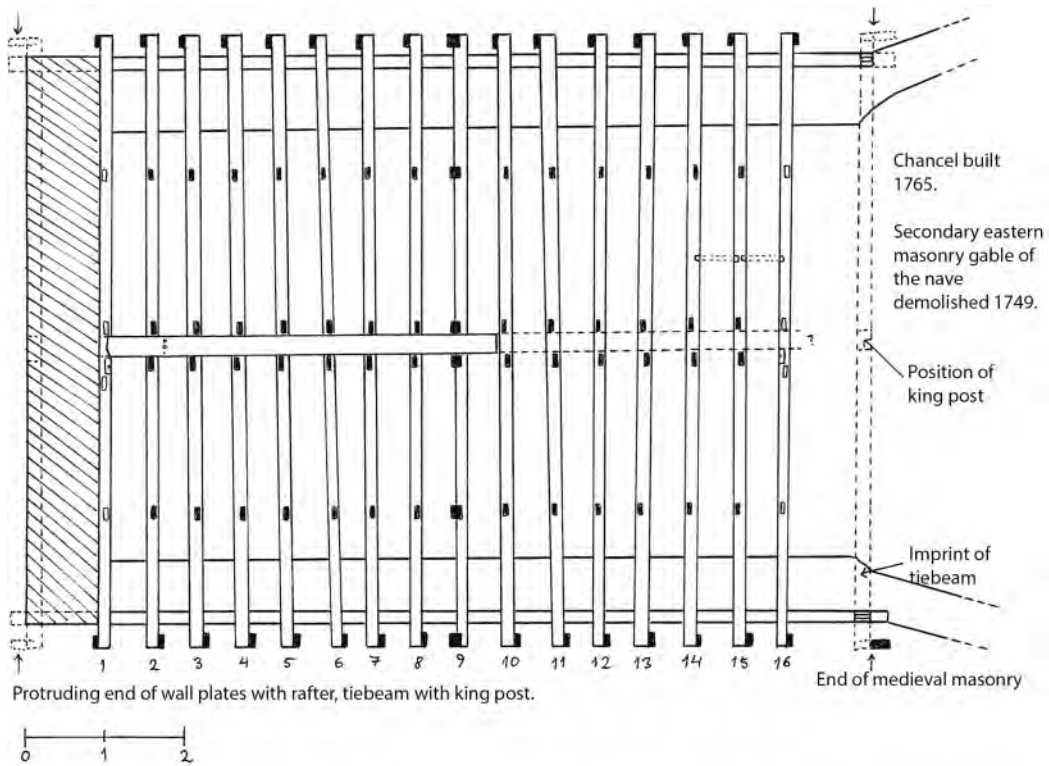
Plan of the nave roof in Edåsa church. Drawing. R. Gullbrandsson.
